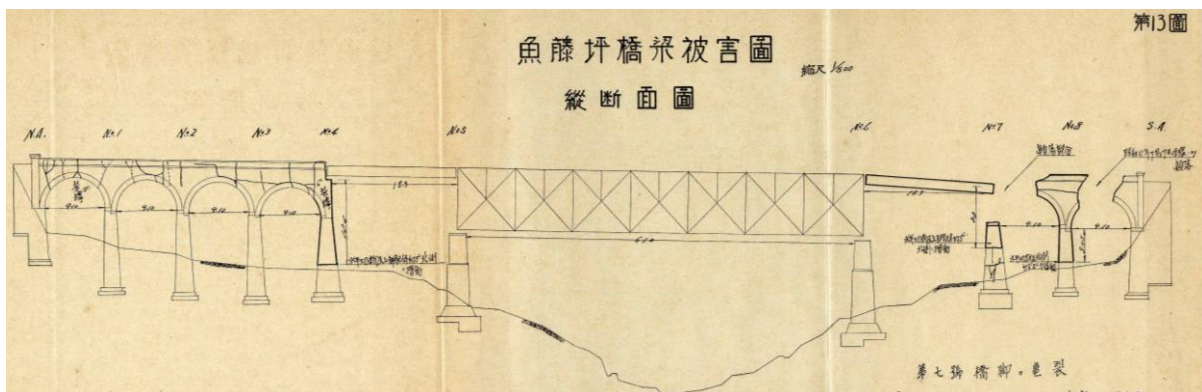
The damage of Yutengping Broken Bridge in 1935 earthquake [2]
